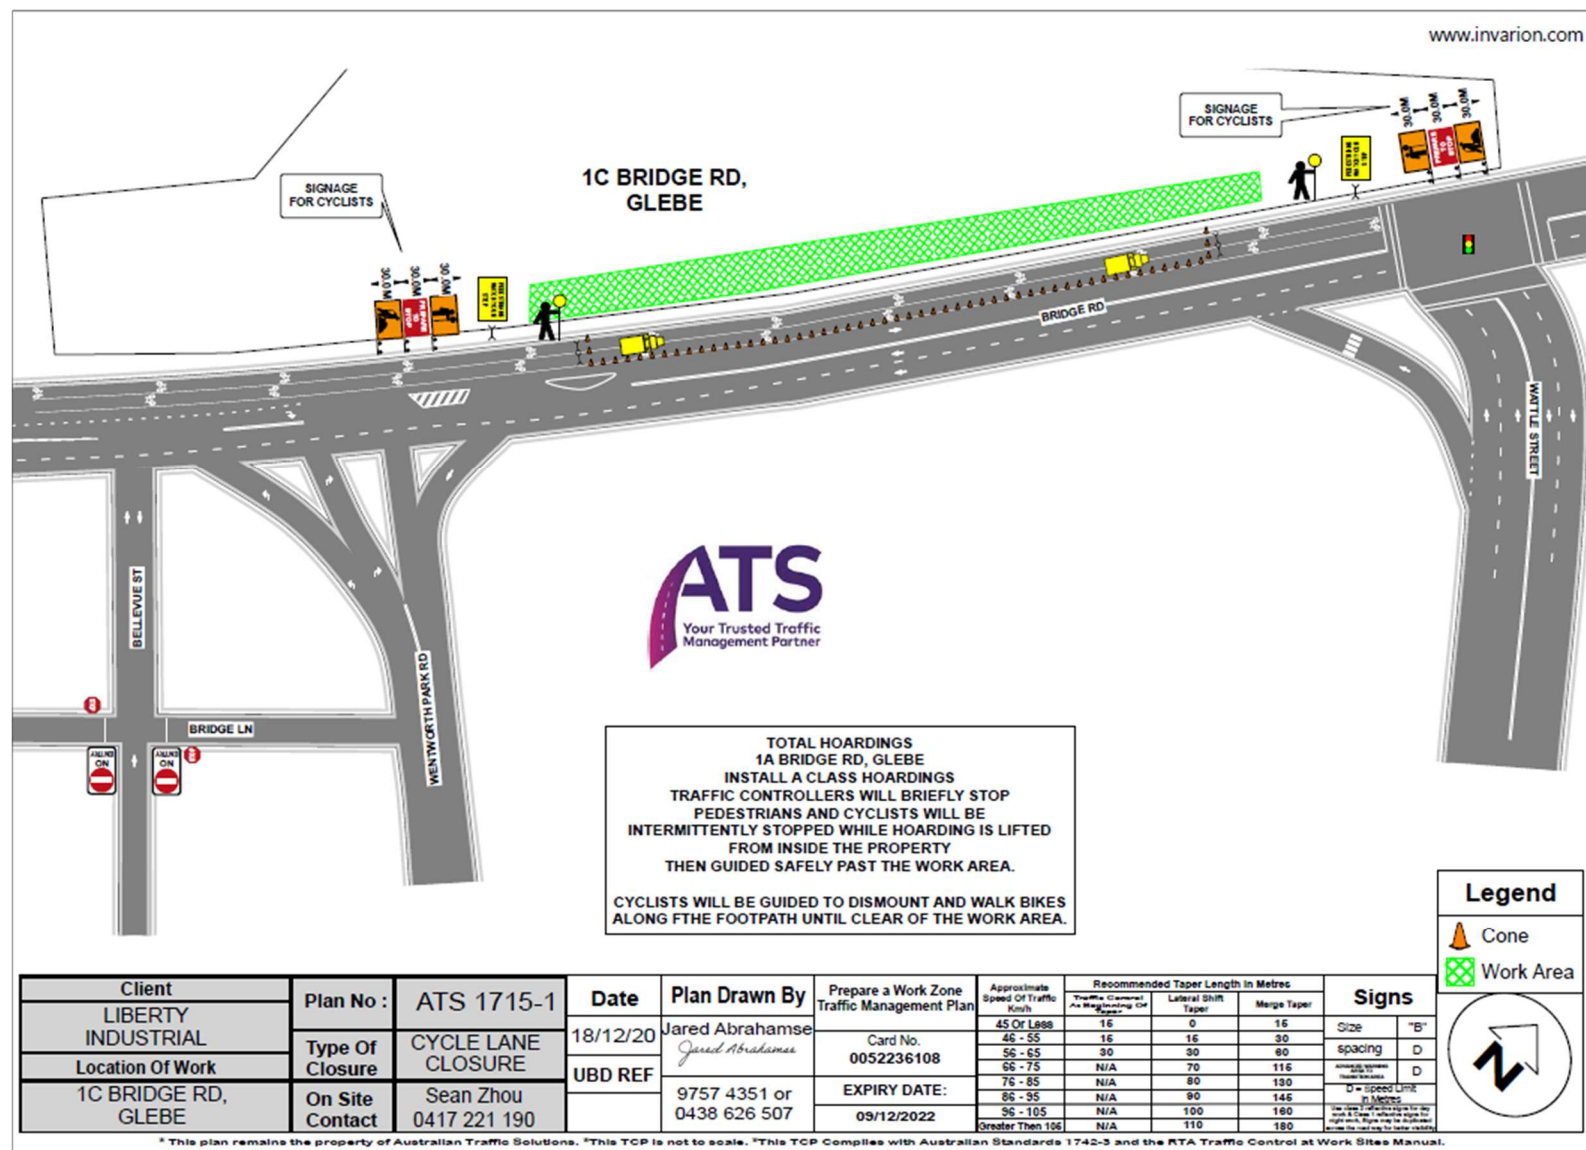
Traffic Control Plan for work undertaking at 1b & c Bridge Road
